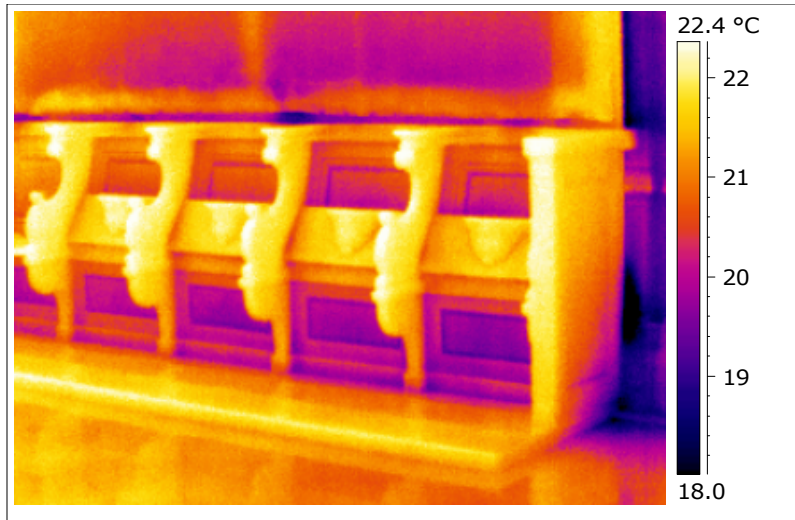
; IRT North-East façade; surface cooling behind the textile and the pews (see table 13 for details)
